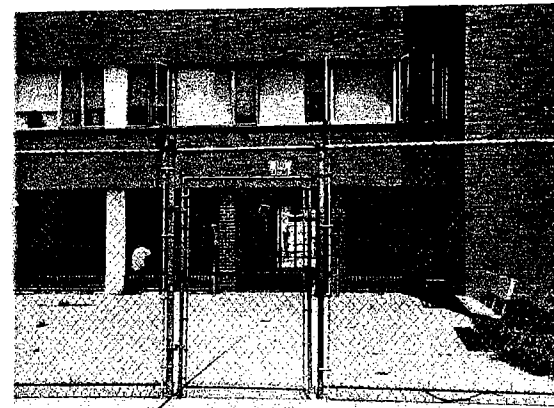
View of Retained Construction Fence and Breezeway Entry at Pruitt-Igoe. Note residents sitting in the breezeway and making use of this now semiprivate defined space. The gate is locked with only tenants of this building having keys. (Photo by author)
